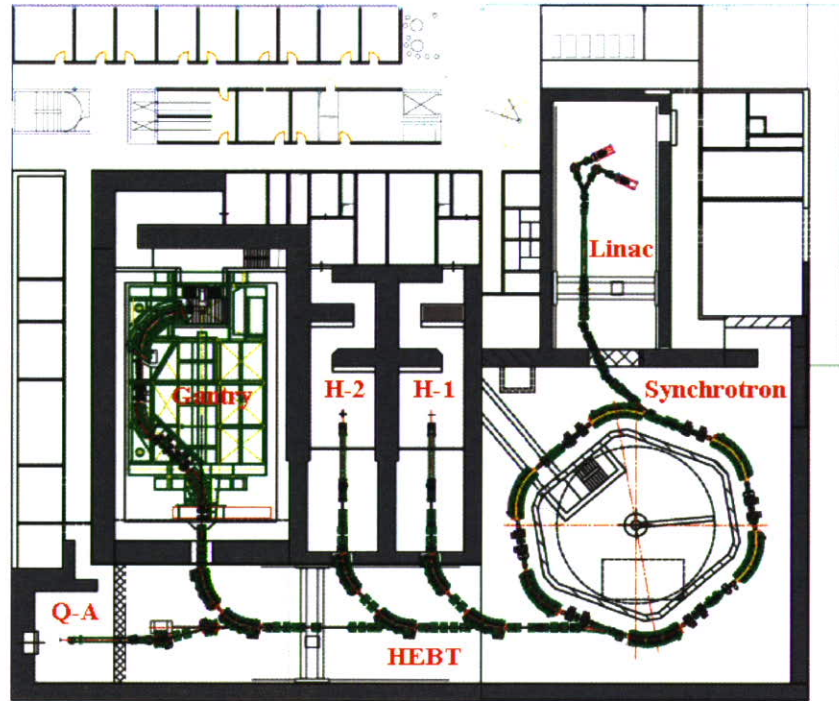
Layout of the first underground floor, housing the accelerator complex
